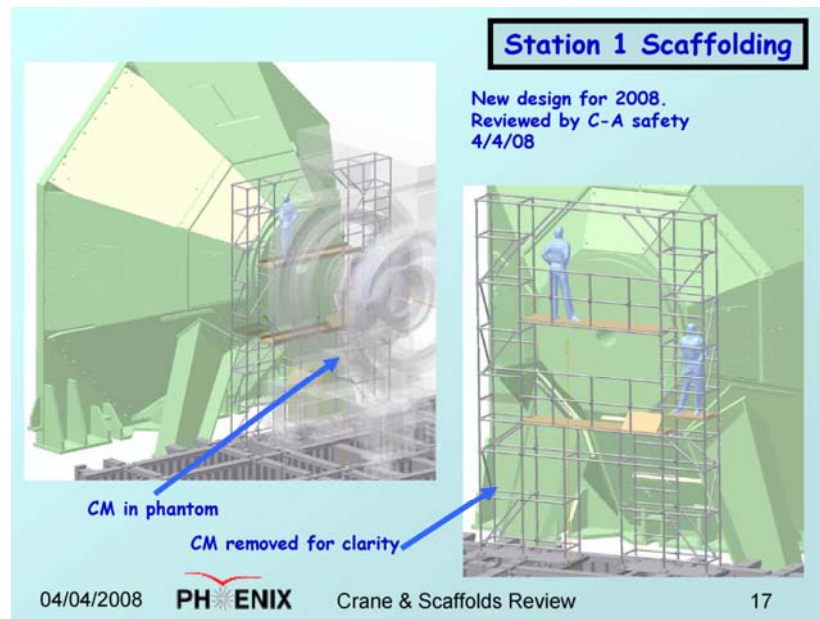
Station 1 Scaffold (Note: pictures are from MuTrigger North installation. South installation is similar)
